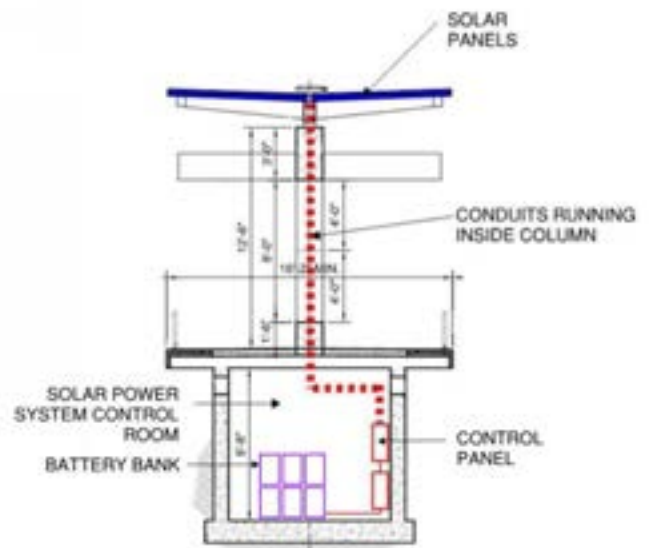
Proposed concept for a solar power system control room and battery bank below platform, at-grade stations. A similar layout should be used for aerial stations.
